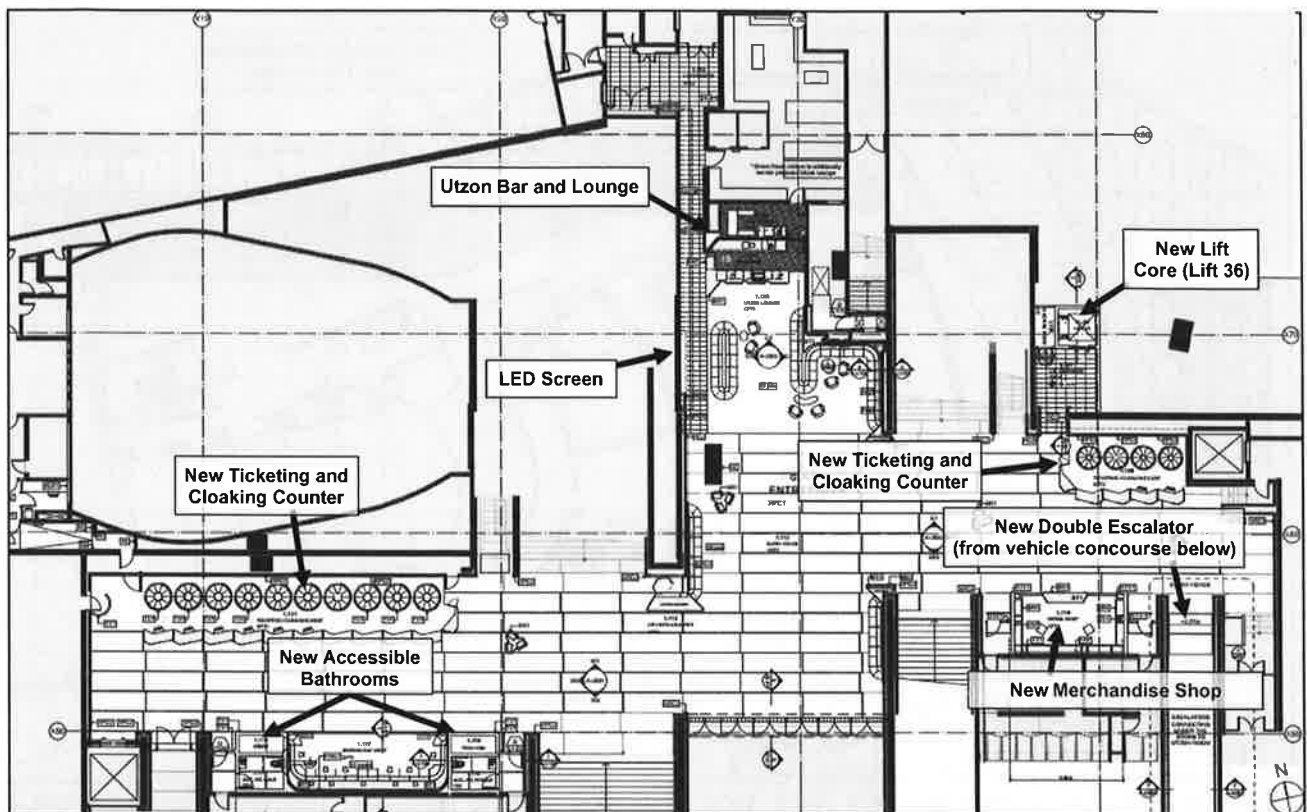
Proposed refurbishment to the entry foyer (Level 1) (Source: EIS)
